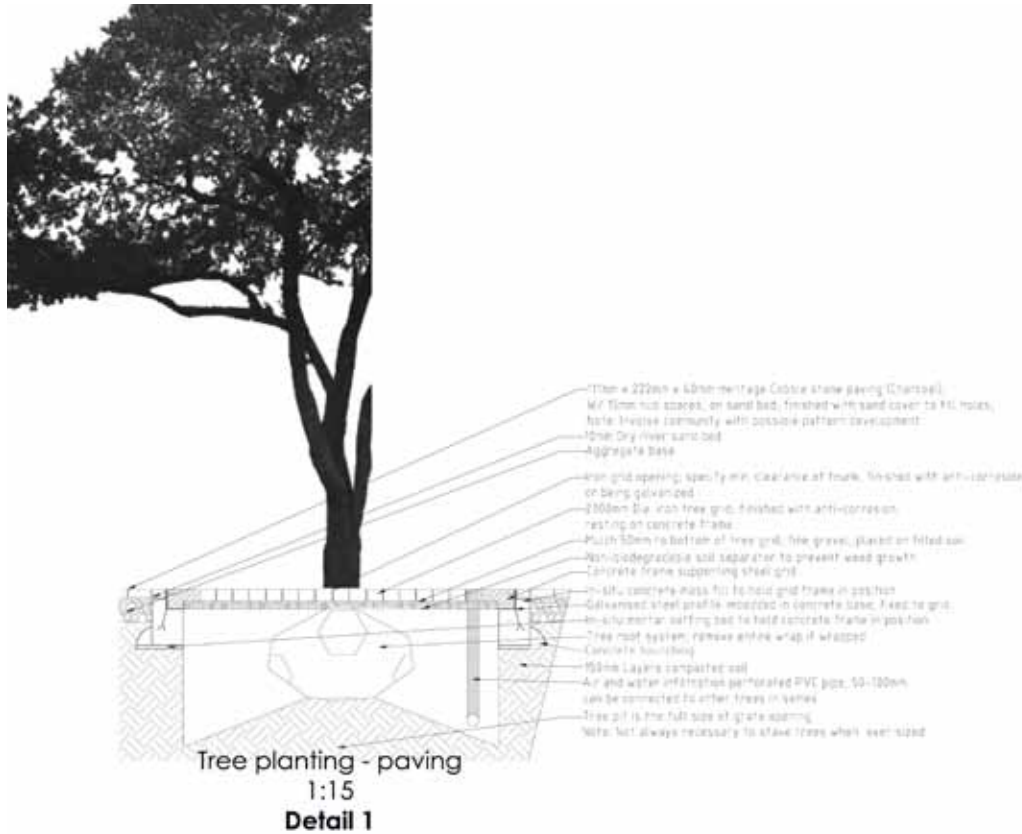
TREE PLANTING - PAVING (not to scale) (AUTHOR, 2011)
